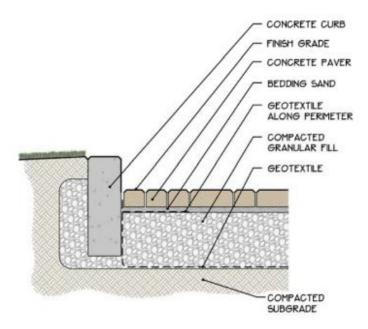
Example Permeable Paver Blocks Cross-section (Source: EPA, 2009)
